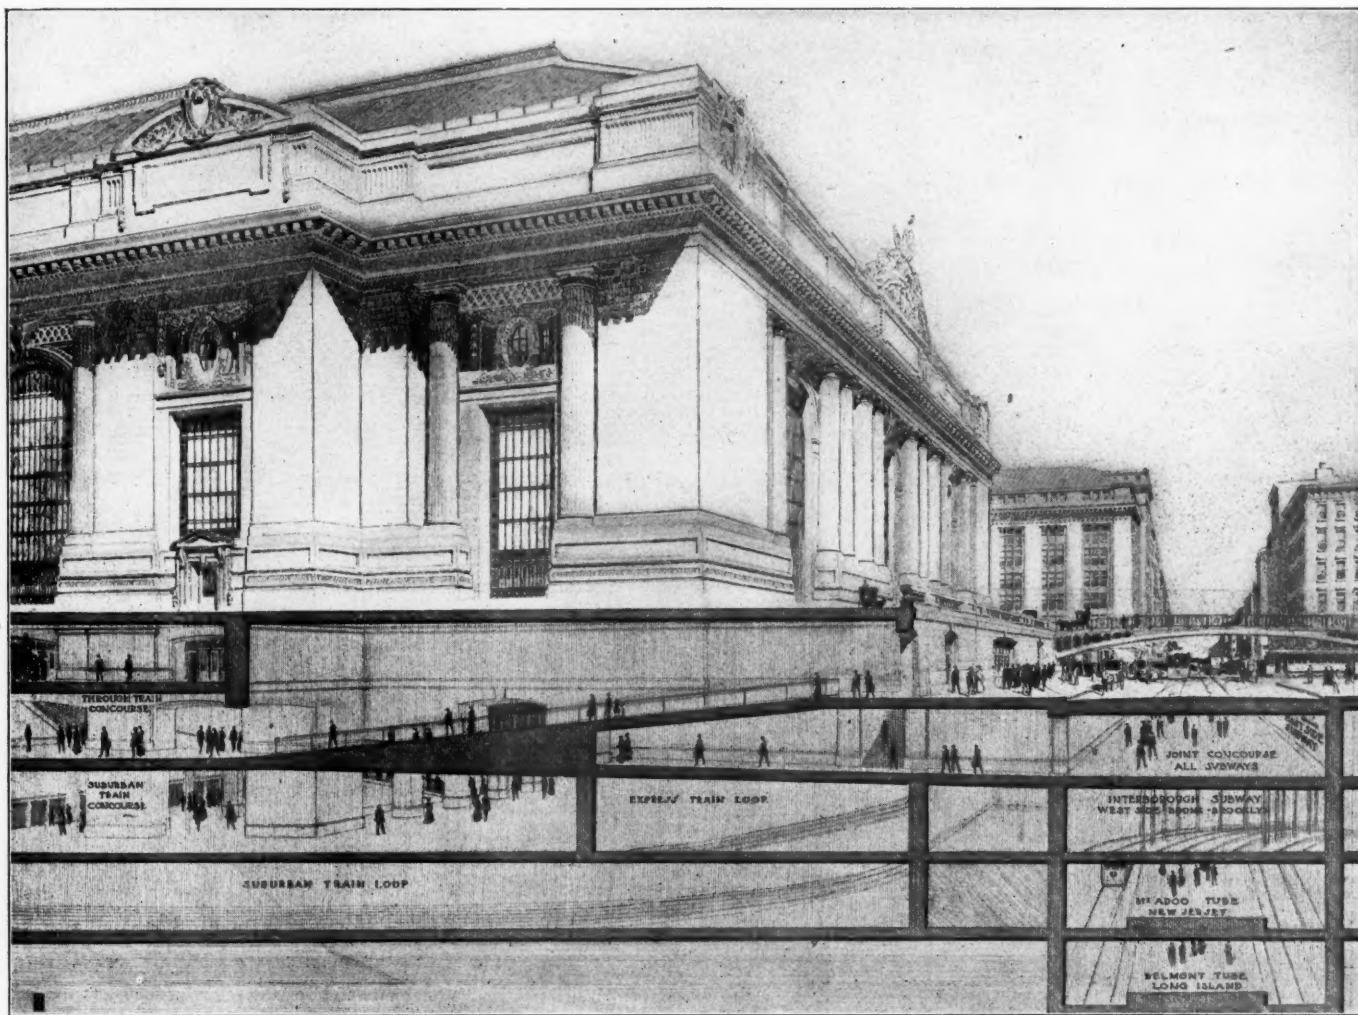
Grand Central Terminal, New York City. Proposed Elevated, Surface and Underground Approaches.
